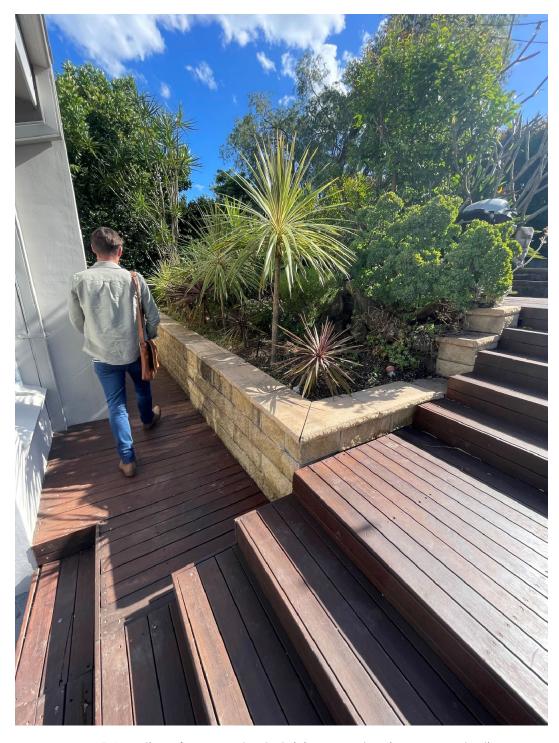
Location of proposed entertaining area showing screen planting on adjoining property. Deck, steps and retaining walls to be removed.
